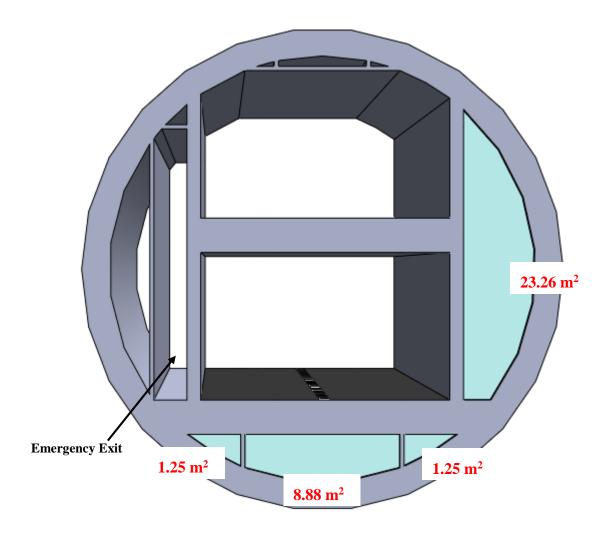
Tunnel Cross-Section Sketch based on the Cross-Section in Rambøll's "Østlig Ringvej København"
